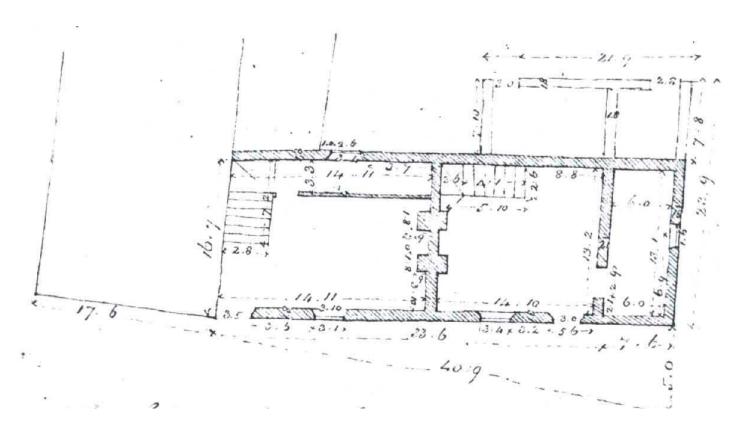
Measured plan of building in Llangollen (from Provis Notebook 3)
